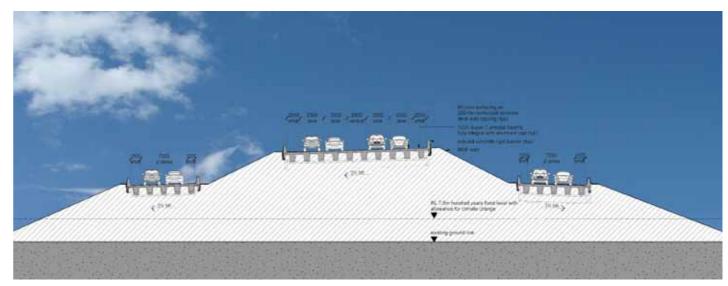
Bridge 15: Pauatahanui Stream Crossing long section
